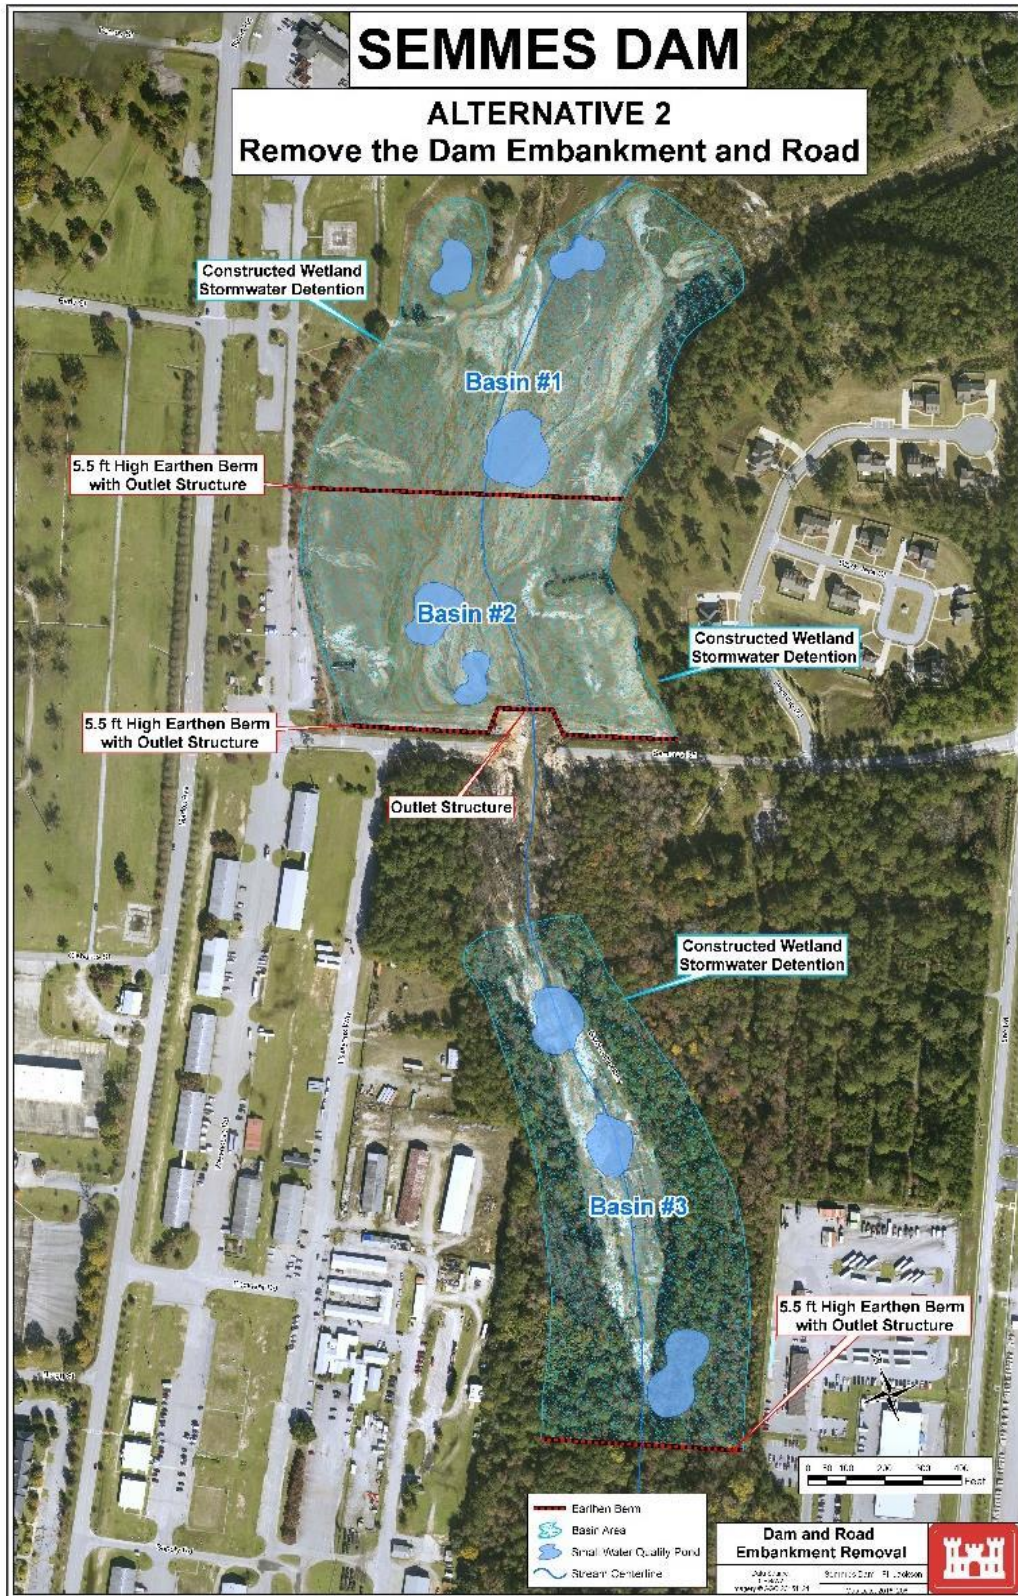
Alternative 2 Remove Dam Embankment and Road; Provide Stormwater Detention (Conceptual Design)
